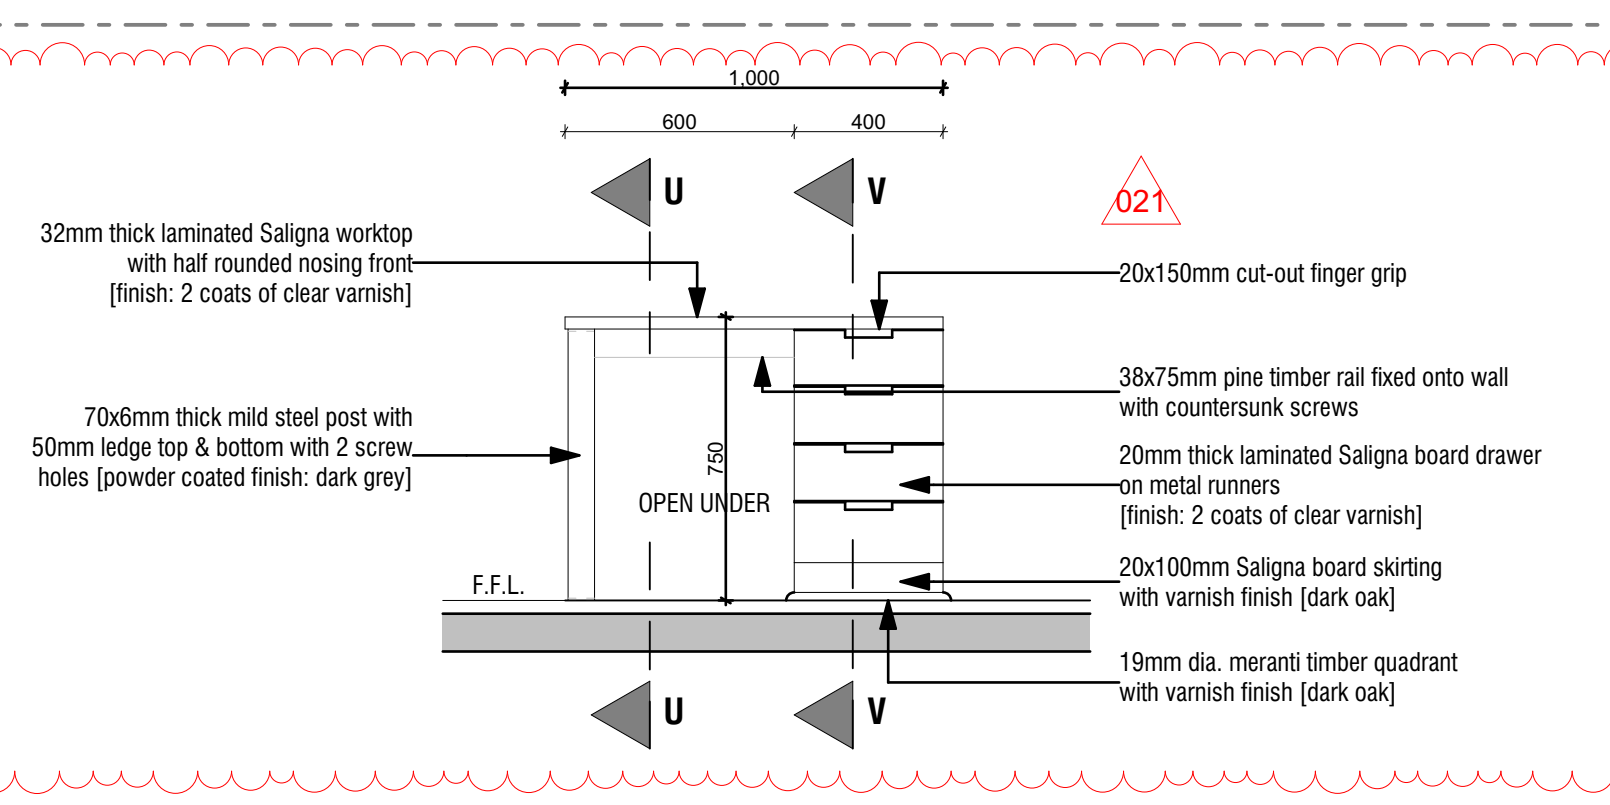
DETAIL No. DESK & CUPBOARD DETAIL	SCALE 1:20	DETAIL DESCRIPTION DESK & CUPBOARD DETAIL : ELEVATION A ELEVATION B	LOCATION DUTY ROOM 0 006
